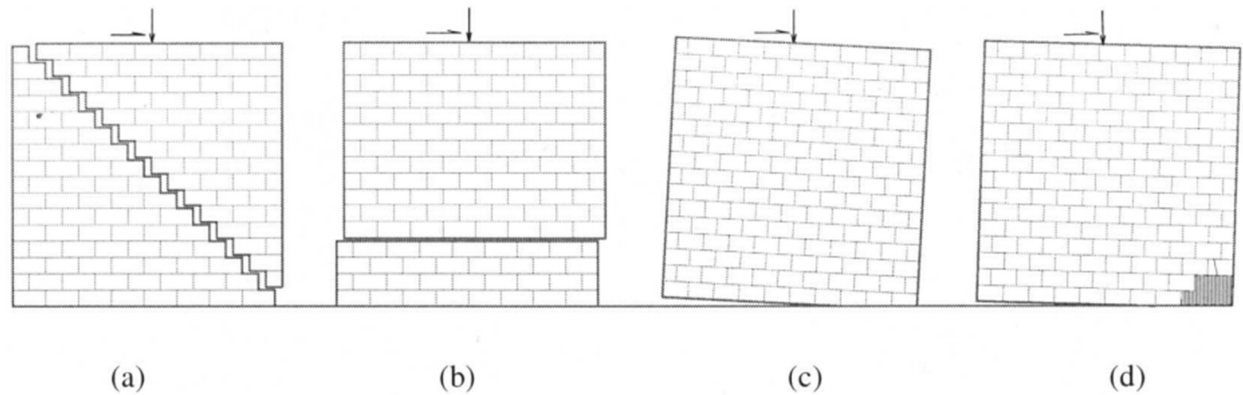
In-plane failure mechanisms of a URM wall: (a) shear failure, (b) sliding failure, (c) rocking failure, and (d) toe crushing
